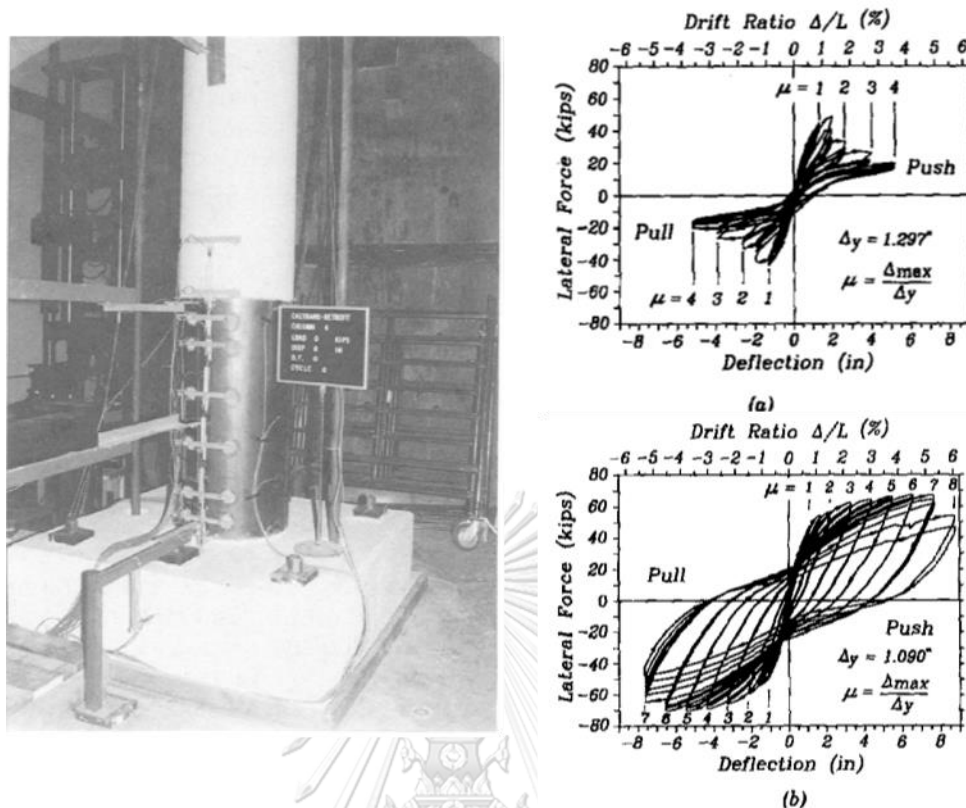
Steel jacket circular bridge column and the hysteresis response of as built and retrofitted circular columns (Chai et al., 1994)
